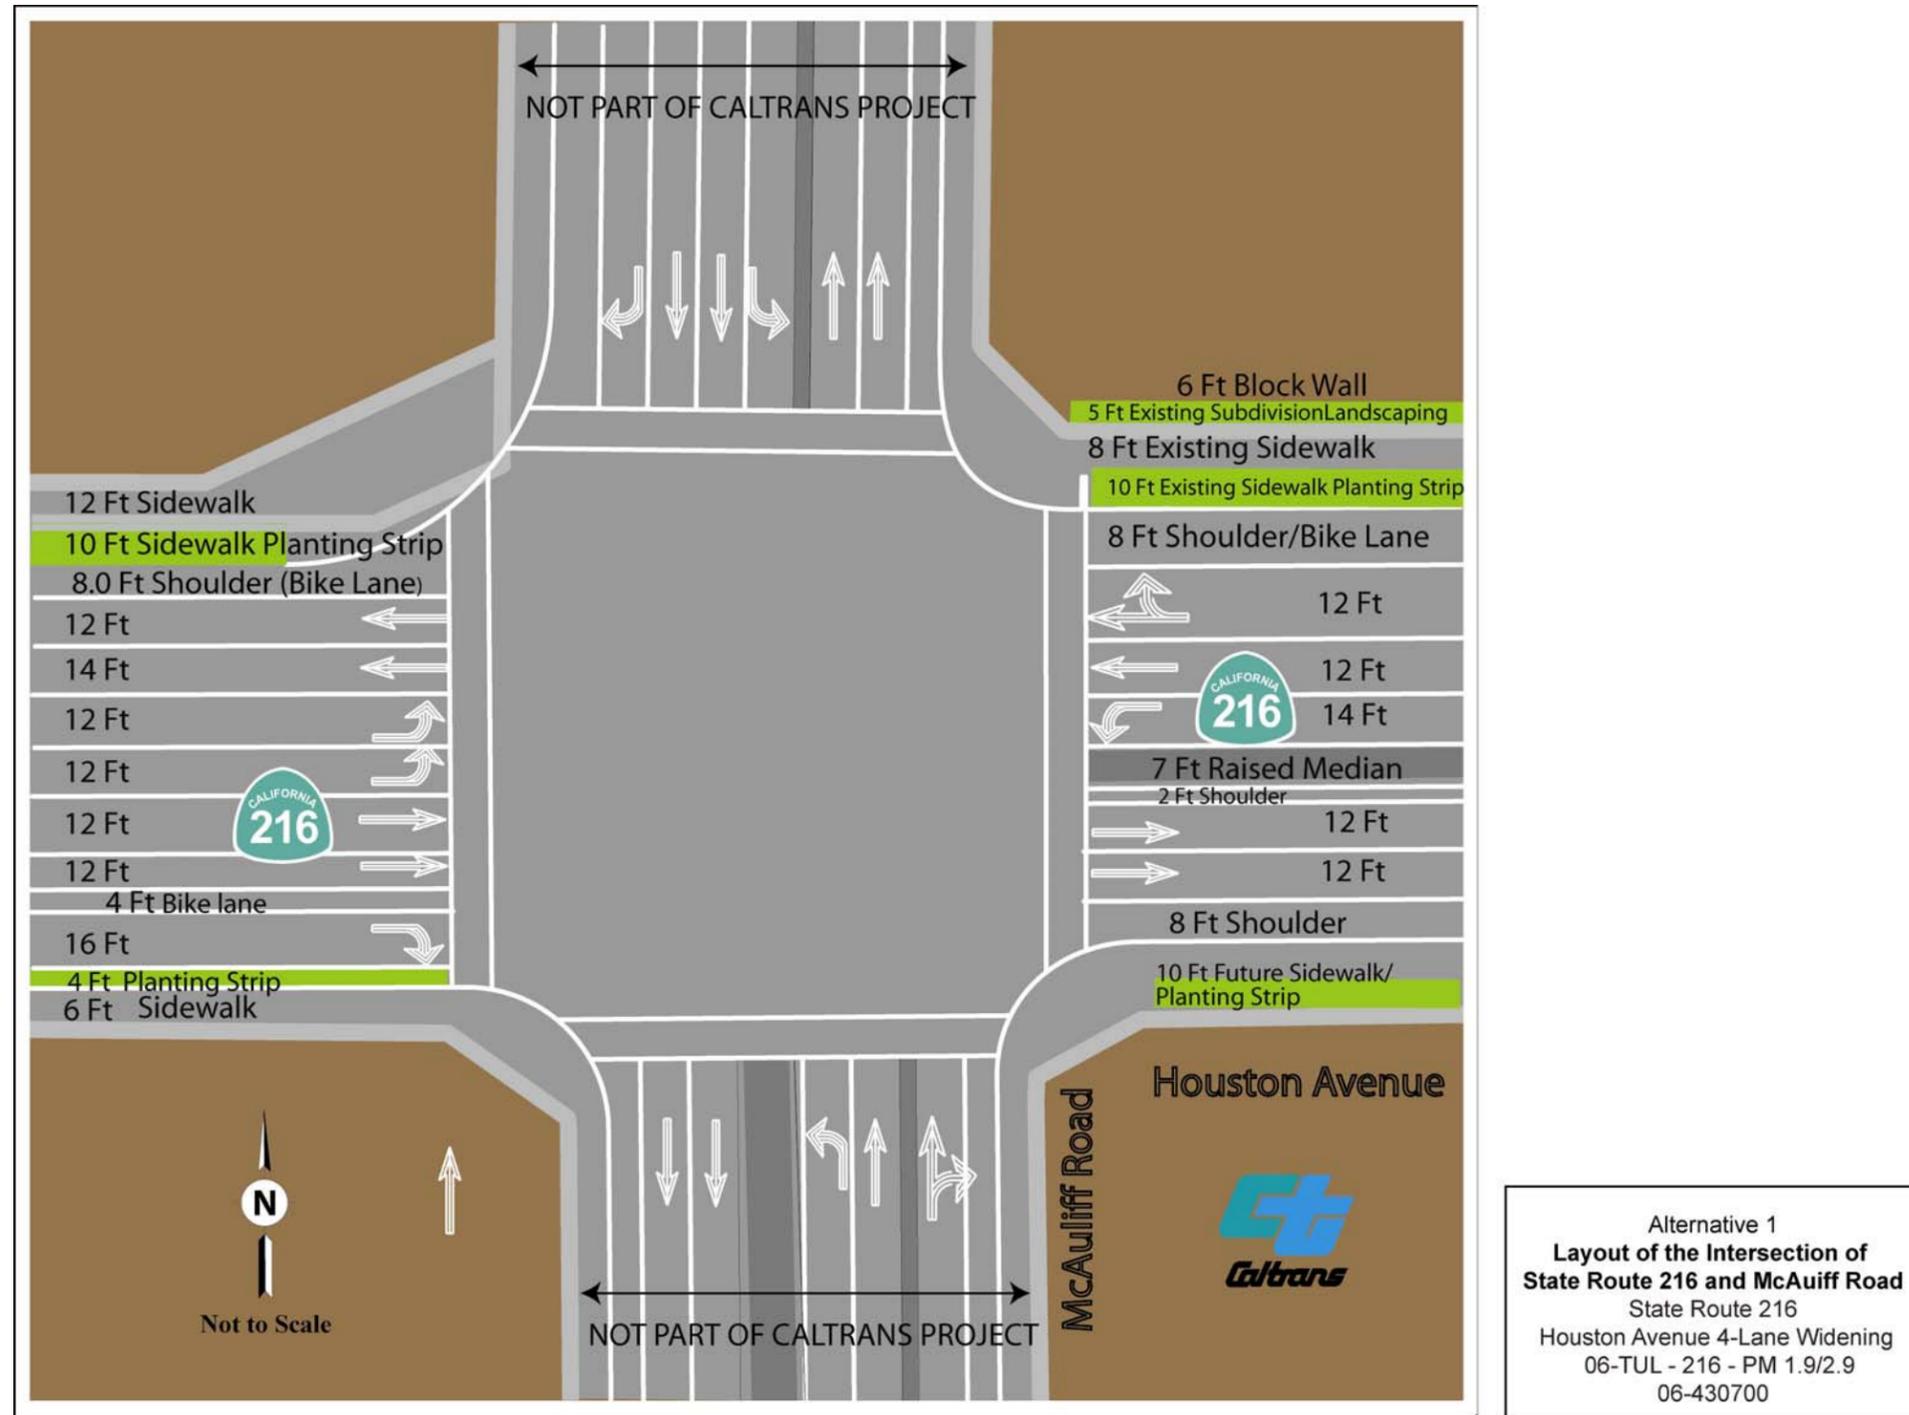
Layout of the Intersection of State Route 216 and McAuliff Road
